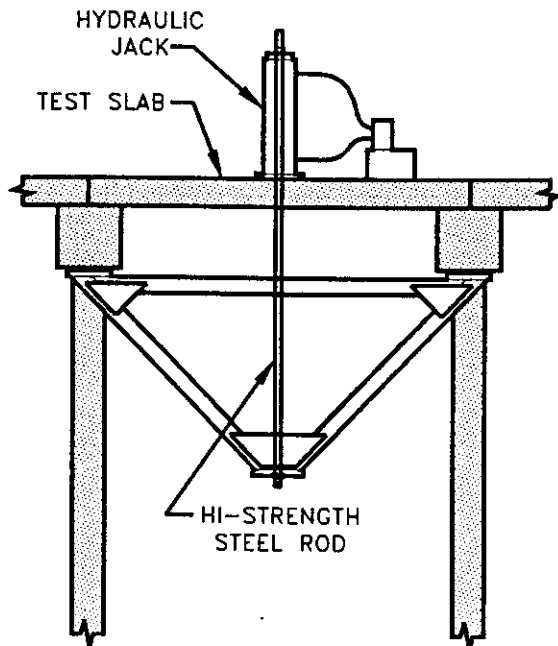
Large scale tests of reinforced concrete decks upgraded with CFRP sheets.
